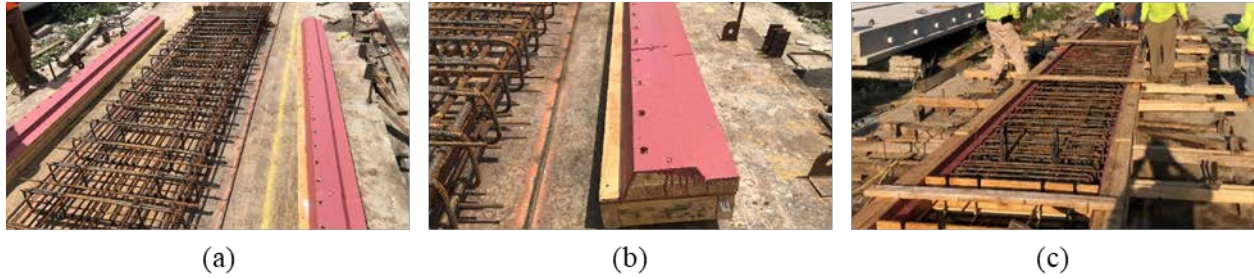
Construction of reinforcing cage and formwork for full-scale beams: (a) prestressing strand and reinforcement cage constructed, (b) side forms with paste retarding agent, and (c) assembled formwork and reinforcement ready for casting
